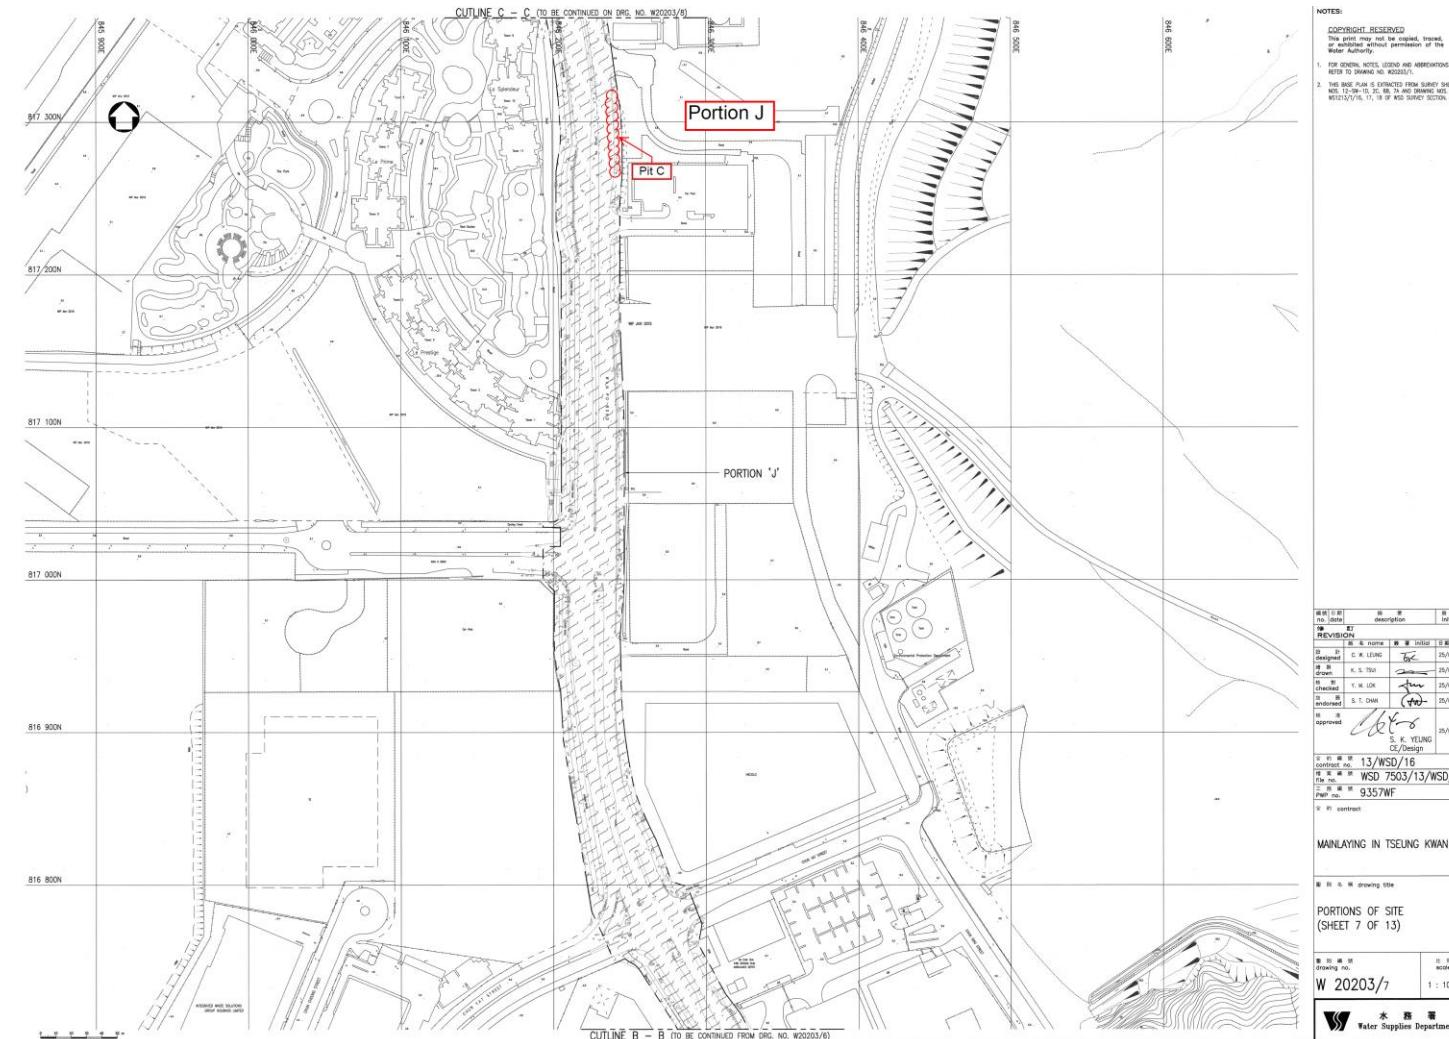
Location Plan for Portion J – CH.A 19+15 to CH.A 19+50 (Pit C)
